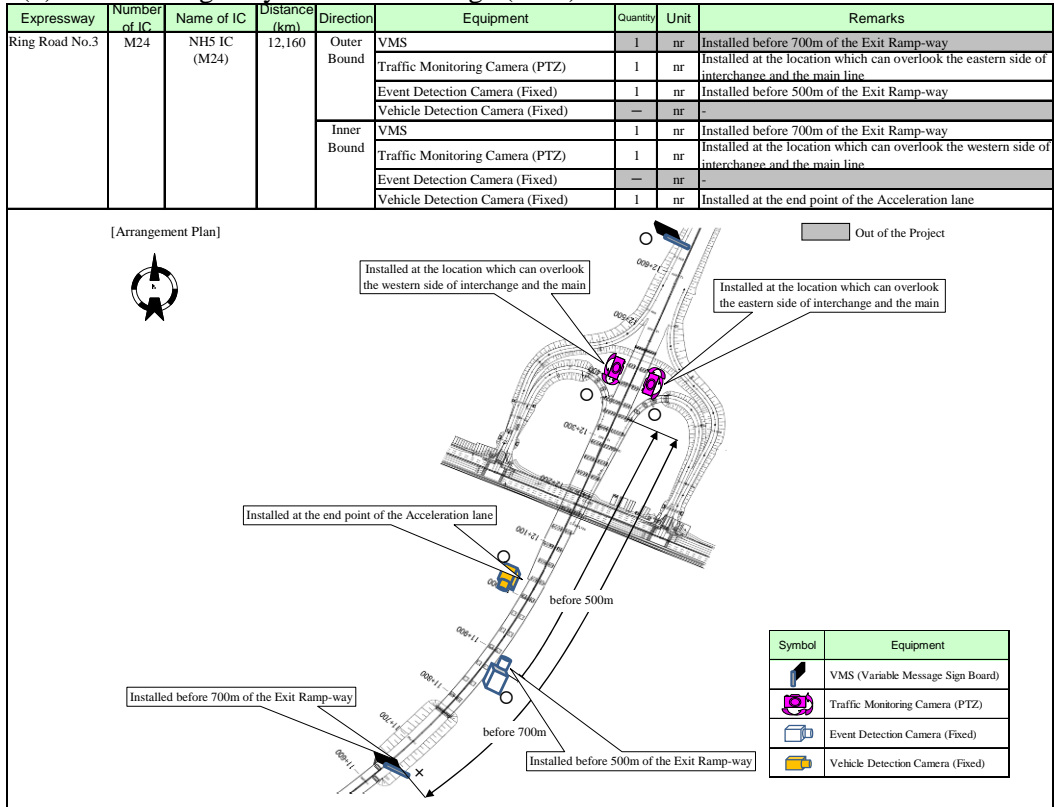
Equipment Layout Plan at NH-5 Interchange (M24)
